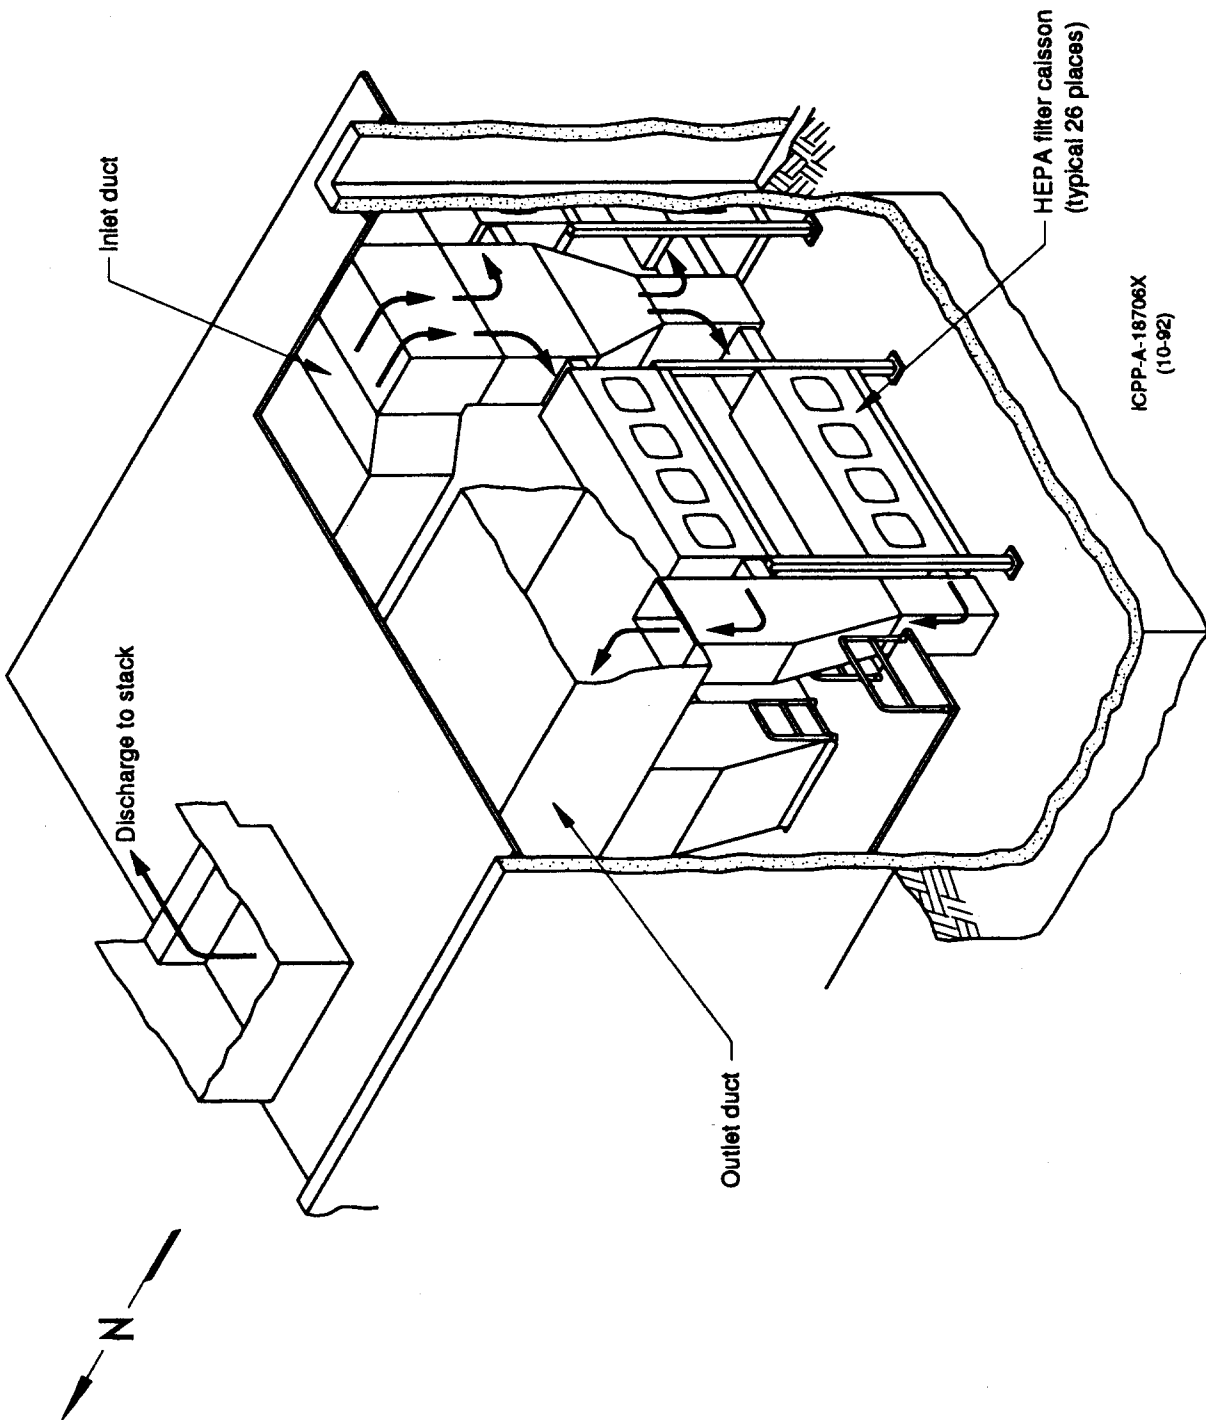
Isometric View of a Section of the Ventilation Air HEPA Building
